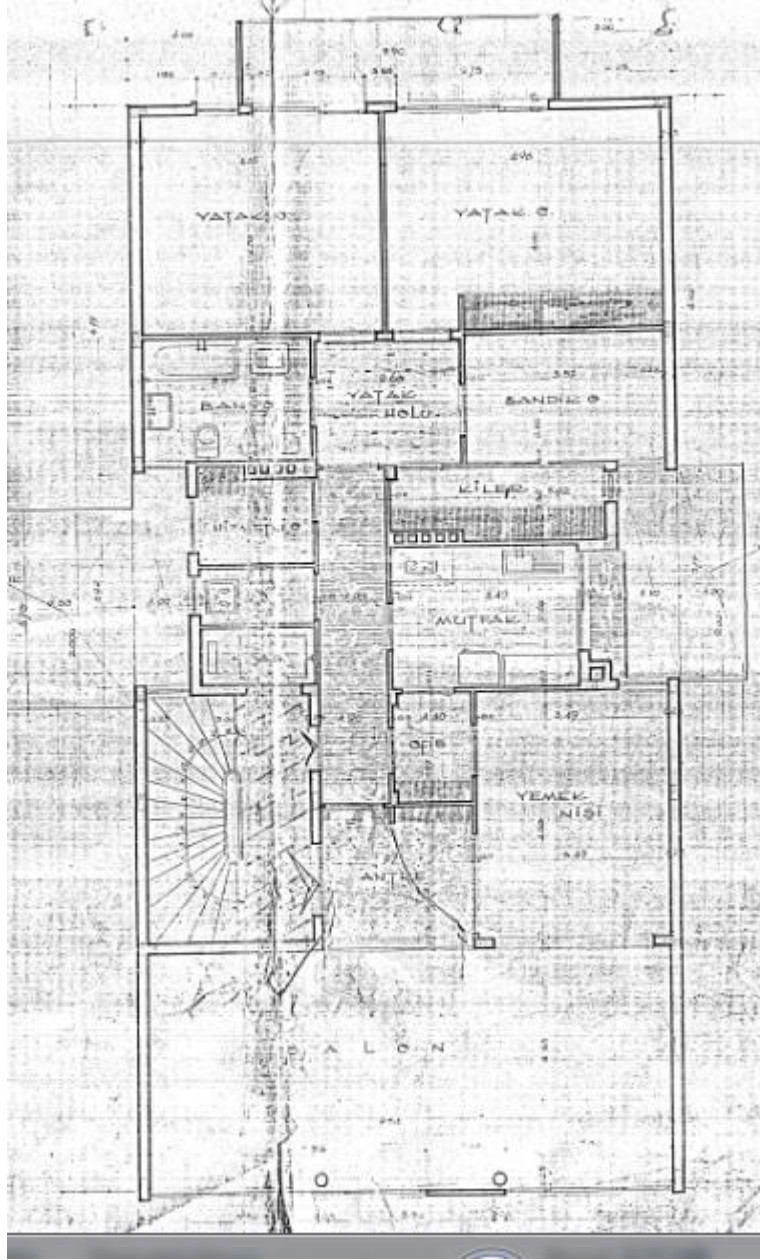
Floor plan of a residential unit in Veziroğlu Apartment
